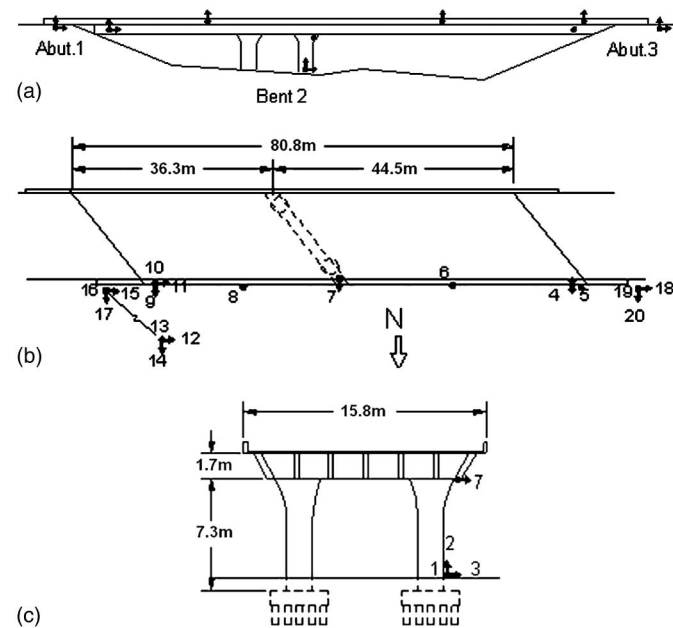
Painter Street Overcrossing and sensor locations: (a) elevation; (b) deck level plan; and (c) section at bent
